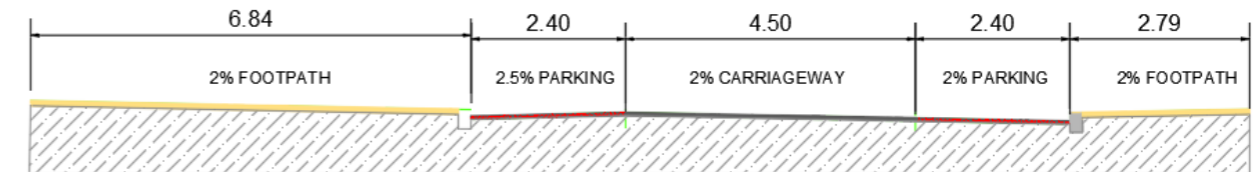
Typical Cross Section of Gladstone St South (from Main Guard to Junction with Market St.)
